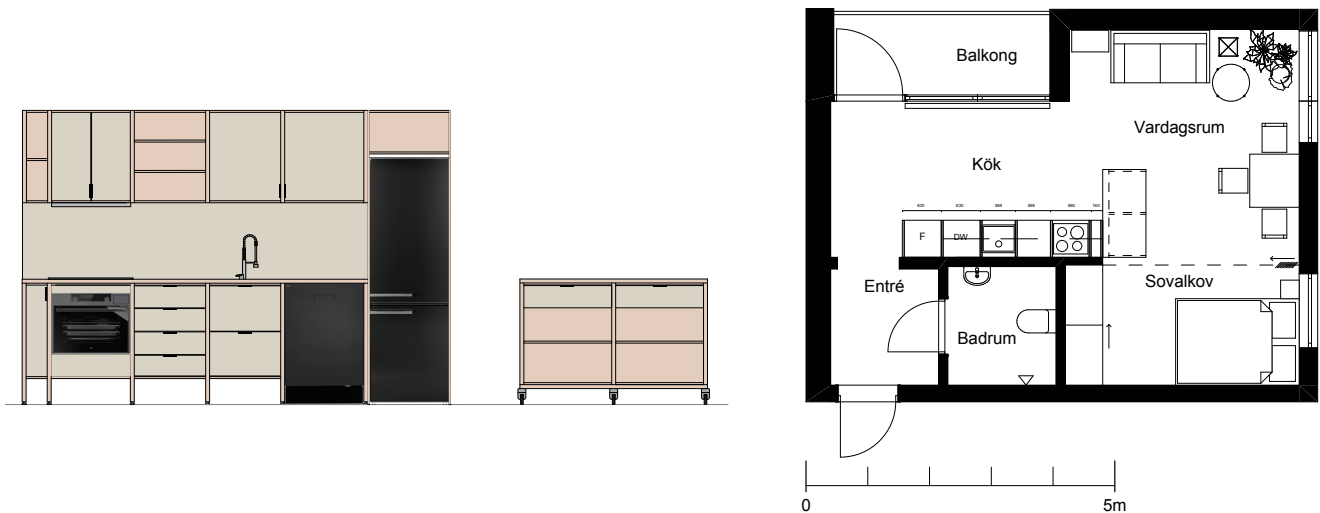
Impression of prototype kitchen for installation in apartment living lab (left) and floorplan (right).
